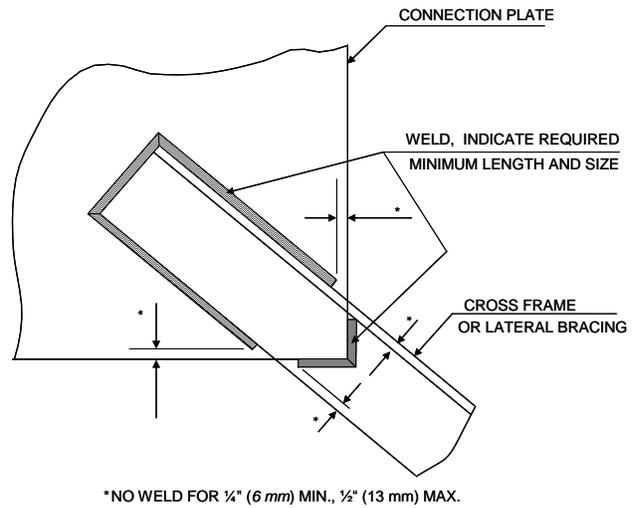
1 Weld termination and coping details for steel members
